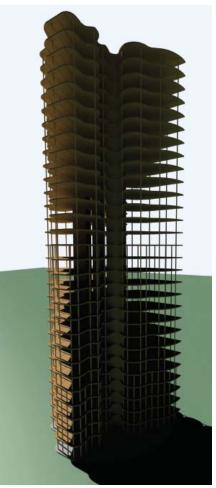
A 30-story timber tower © Lewis Bart Rawson Architects
